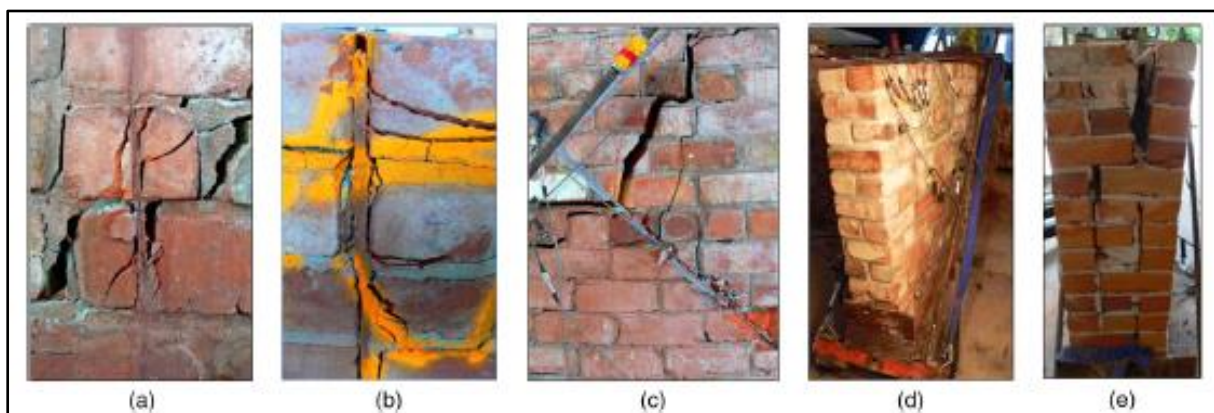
Observed wall deformation and crack patterns: (a) localized cracking R2L2B(wall 3); (b) CFRP strip pull-out R3L2B(wall 9);(c)IC debonding of CFRP strip R2LXB(wall 7);(d) out-of-plane deformation,R2L3S(wall 4);(e) separation of individual leaves,AT2-R3L2B(wall 15)[10]
